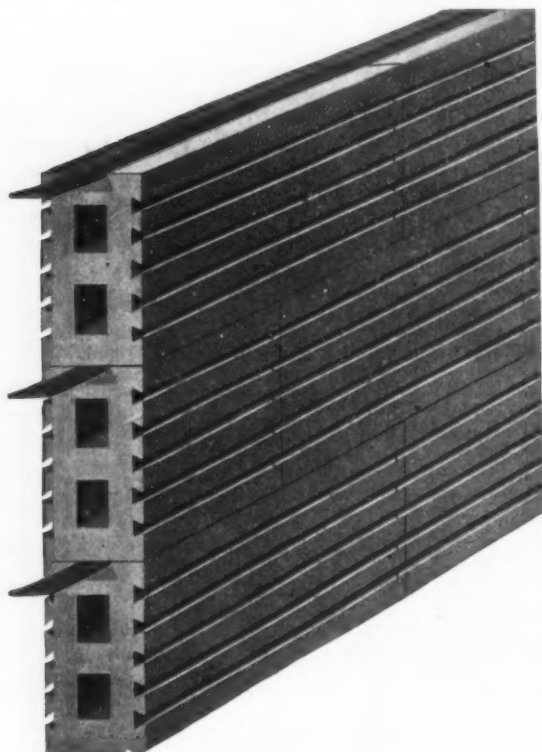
Section of Wall of Phoenix Hollow Tile.
